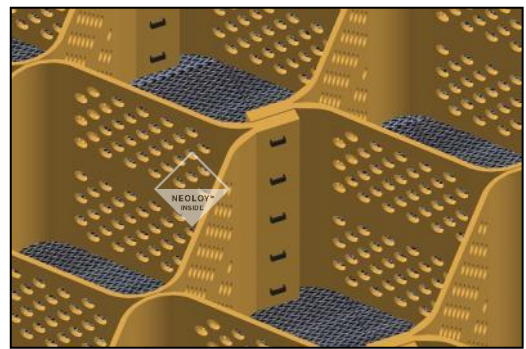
STAPLES FASTENING SECTIONS END TO END– PRS 150 MM
